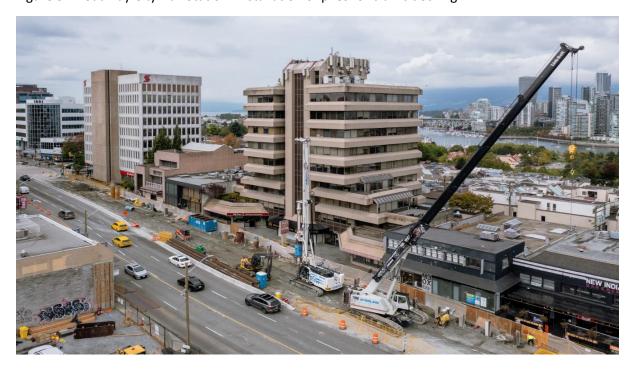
Oak VGH Station: Installation of piles for traffic decking
